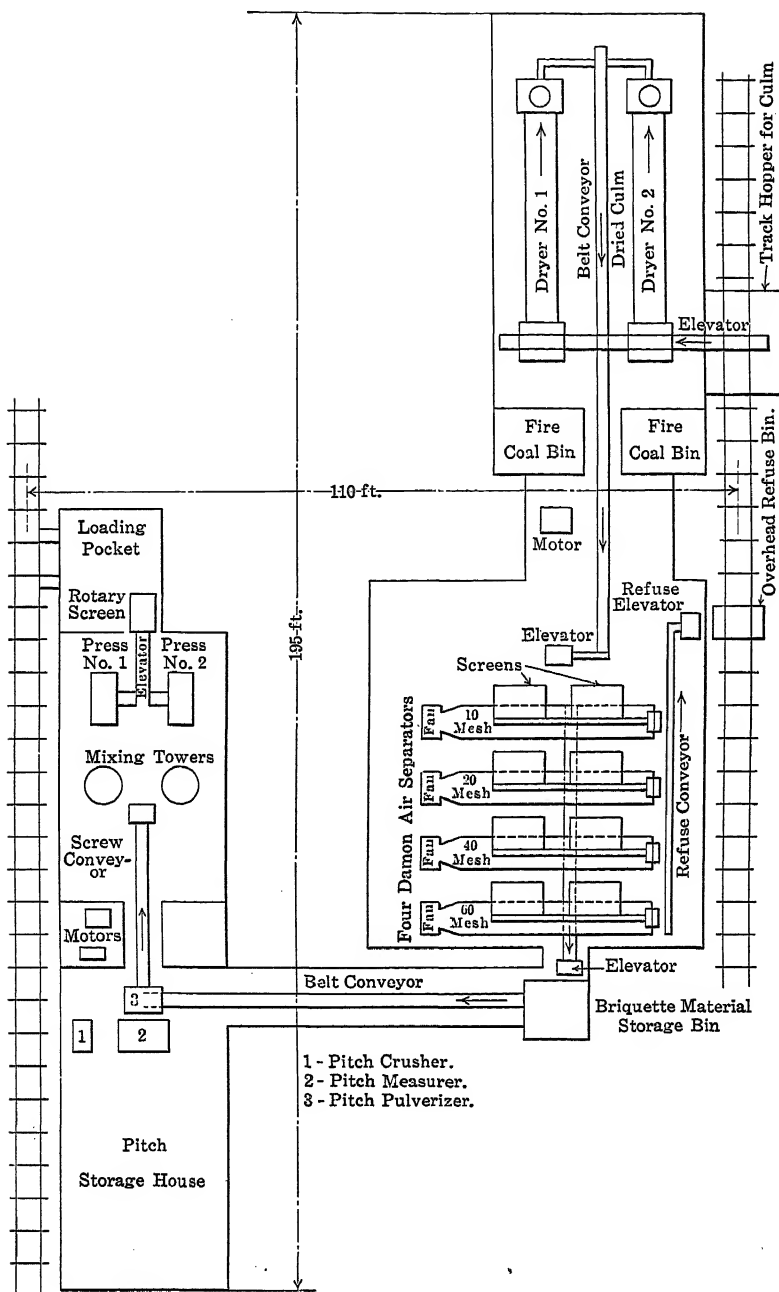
PLAN OF PRESENT BRIQUETTING-PLANT.
